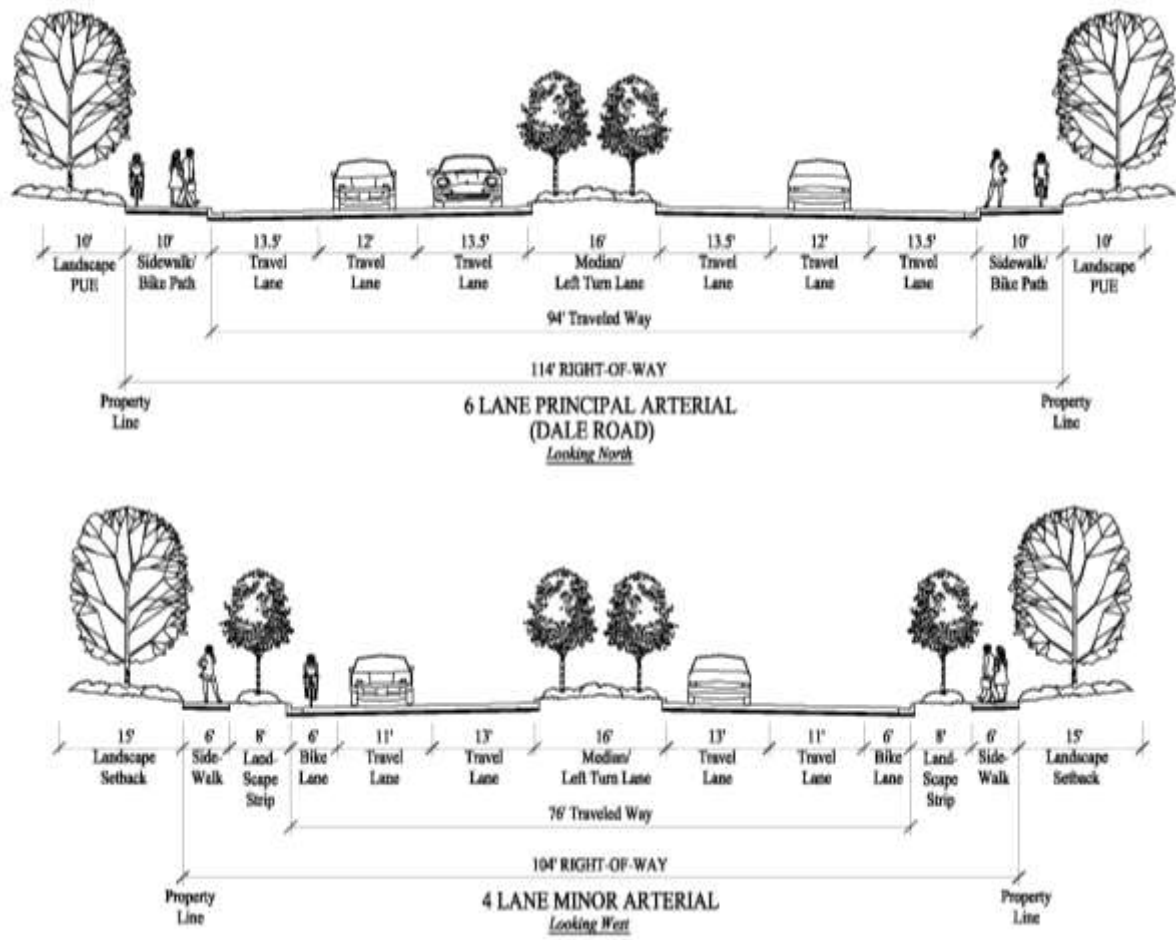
6 Lane Principal Arterial Street Section and 4 Lane Minor Arterial Street Section
